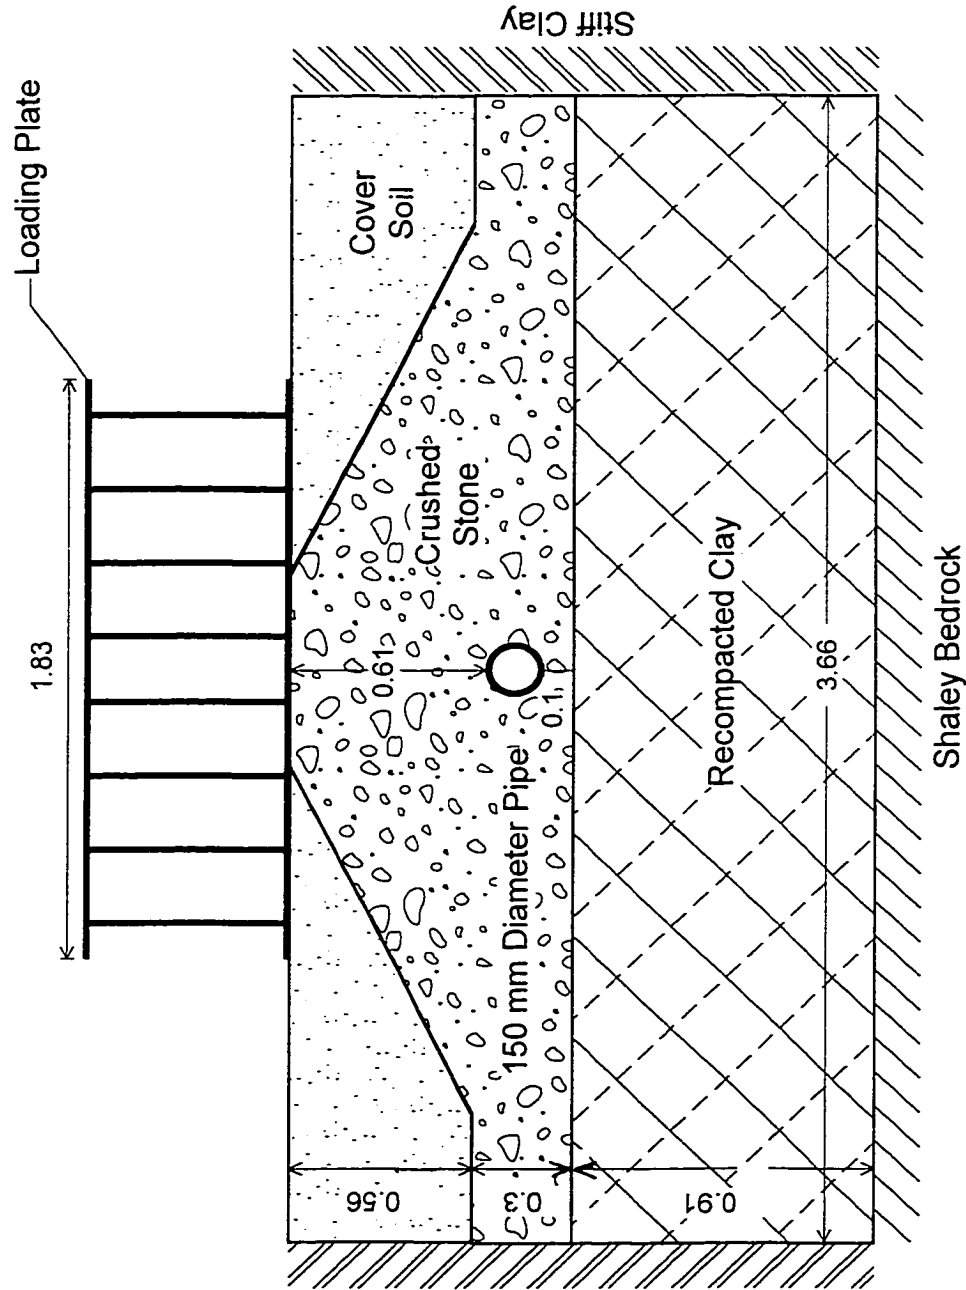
Cross section through Ohio University test facility showing stiff loading plate (modified from Sargand 1993). (Dimensions in metres).
